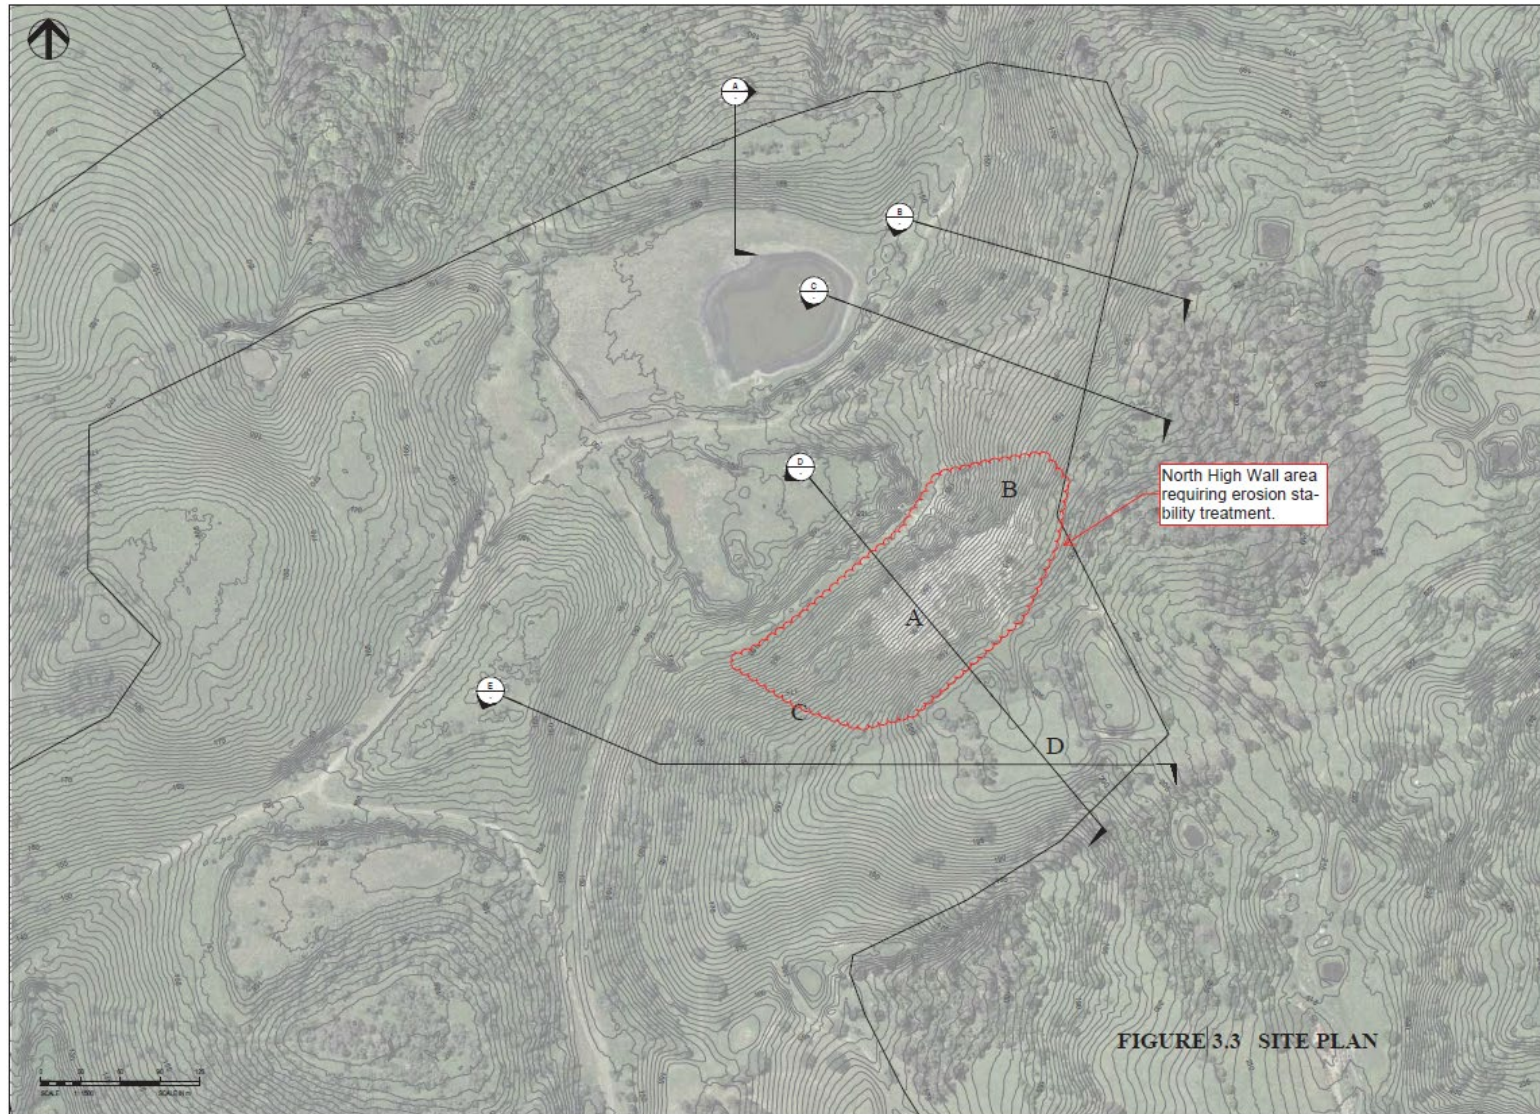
General boundary and cross-sections assessed of the Northern Highwall area with 1m contour overlay
